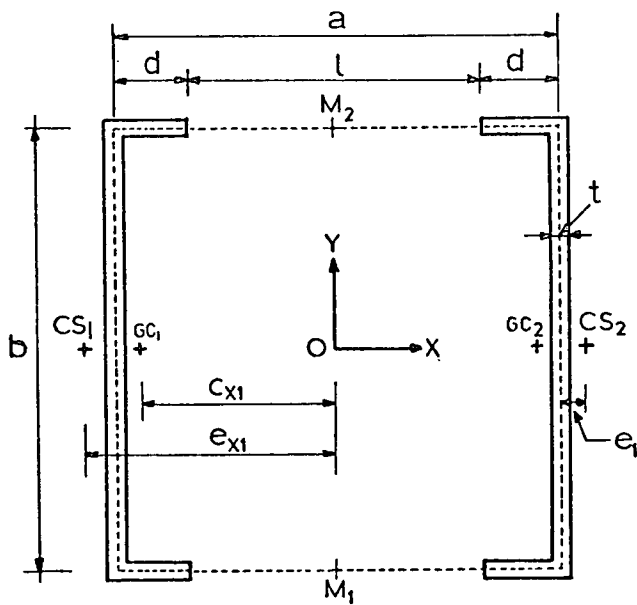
PLAN OF CORE WALL STRUCTURE
